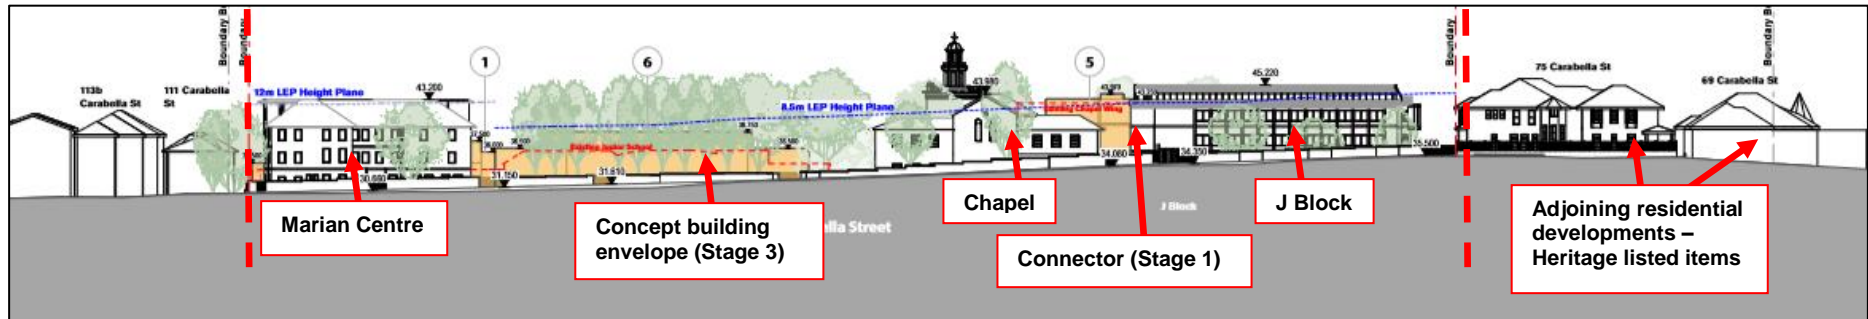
Concept Proposal Envelope elevation (including proposed envelopes of buildings in all stages) - Carabella Street (Source: Applicant's EIS)
